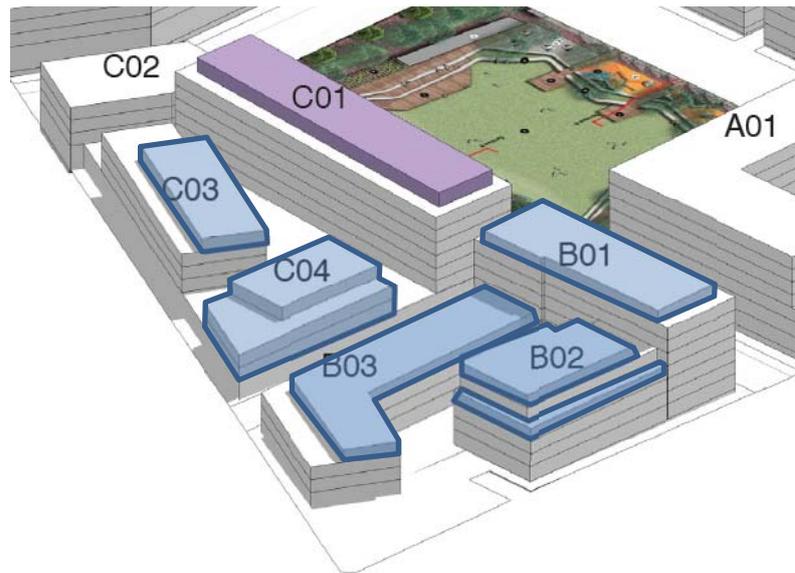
Axonometric drawing illustrating the proposed building envelopes for Blocks B and C, with key changes to storeys and street wall heights highlighted in blue.
